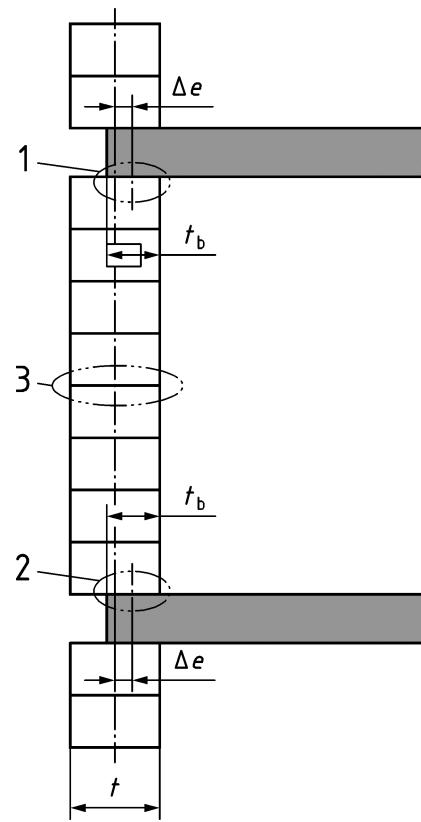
Thickness to be used for the design of a wall at top/bottom or mid-height
